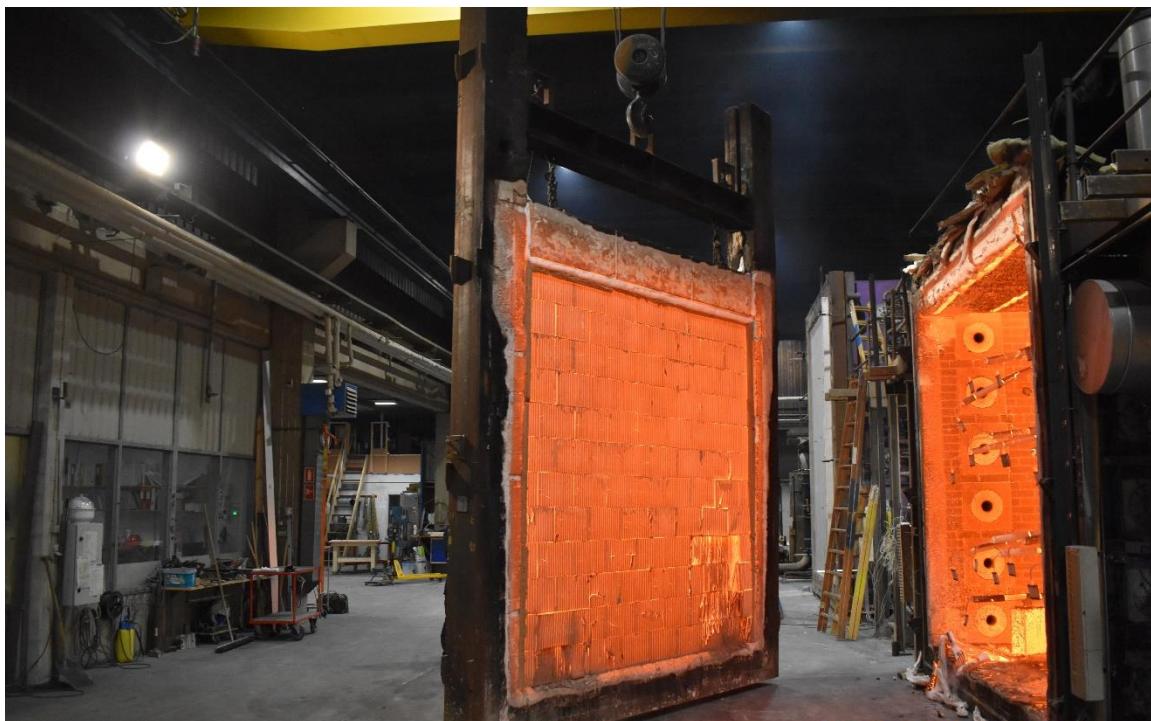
4 hours and 2 minutes of testing. Test stopped ad specimen pulled away from oven.
